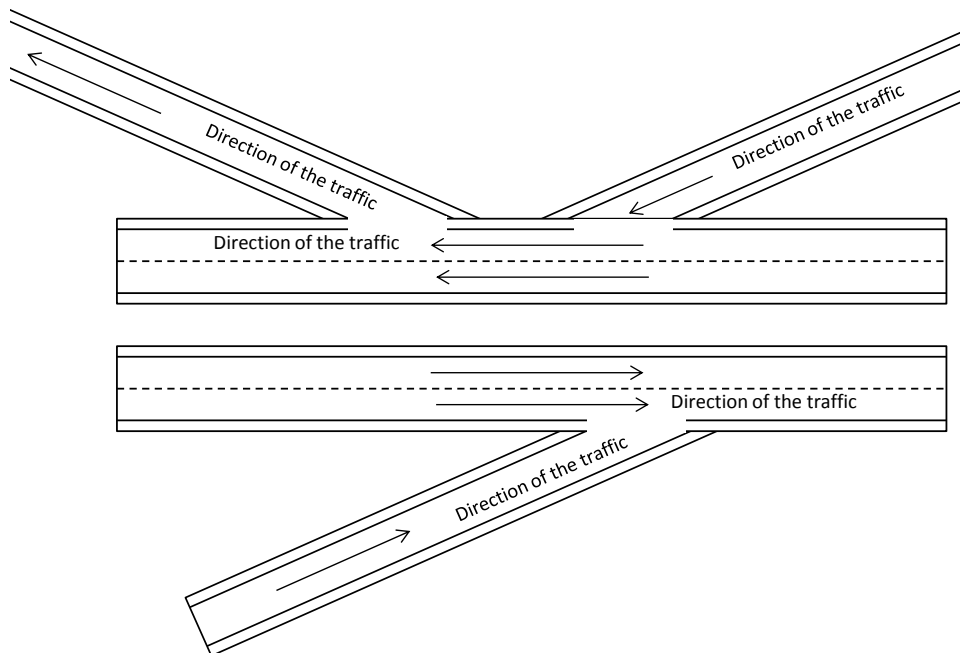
Tunnel system with ramps (here one ramp in one direction and two ramps in the other direction). Each main-tunnel-direction and each ramp will have to be calculated separately in TRANSIT and compiled. The intersection areas are modelled directly by TRANSIT.
